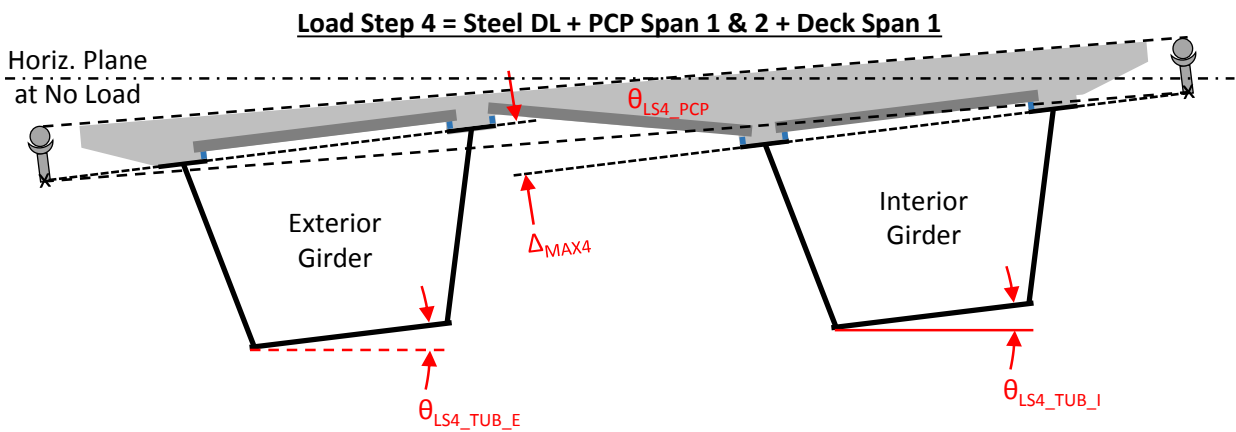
Load Step 4 – Unconnected Steel Tub Girder Twist – Section A-A
